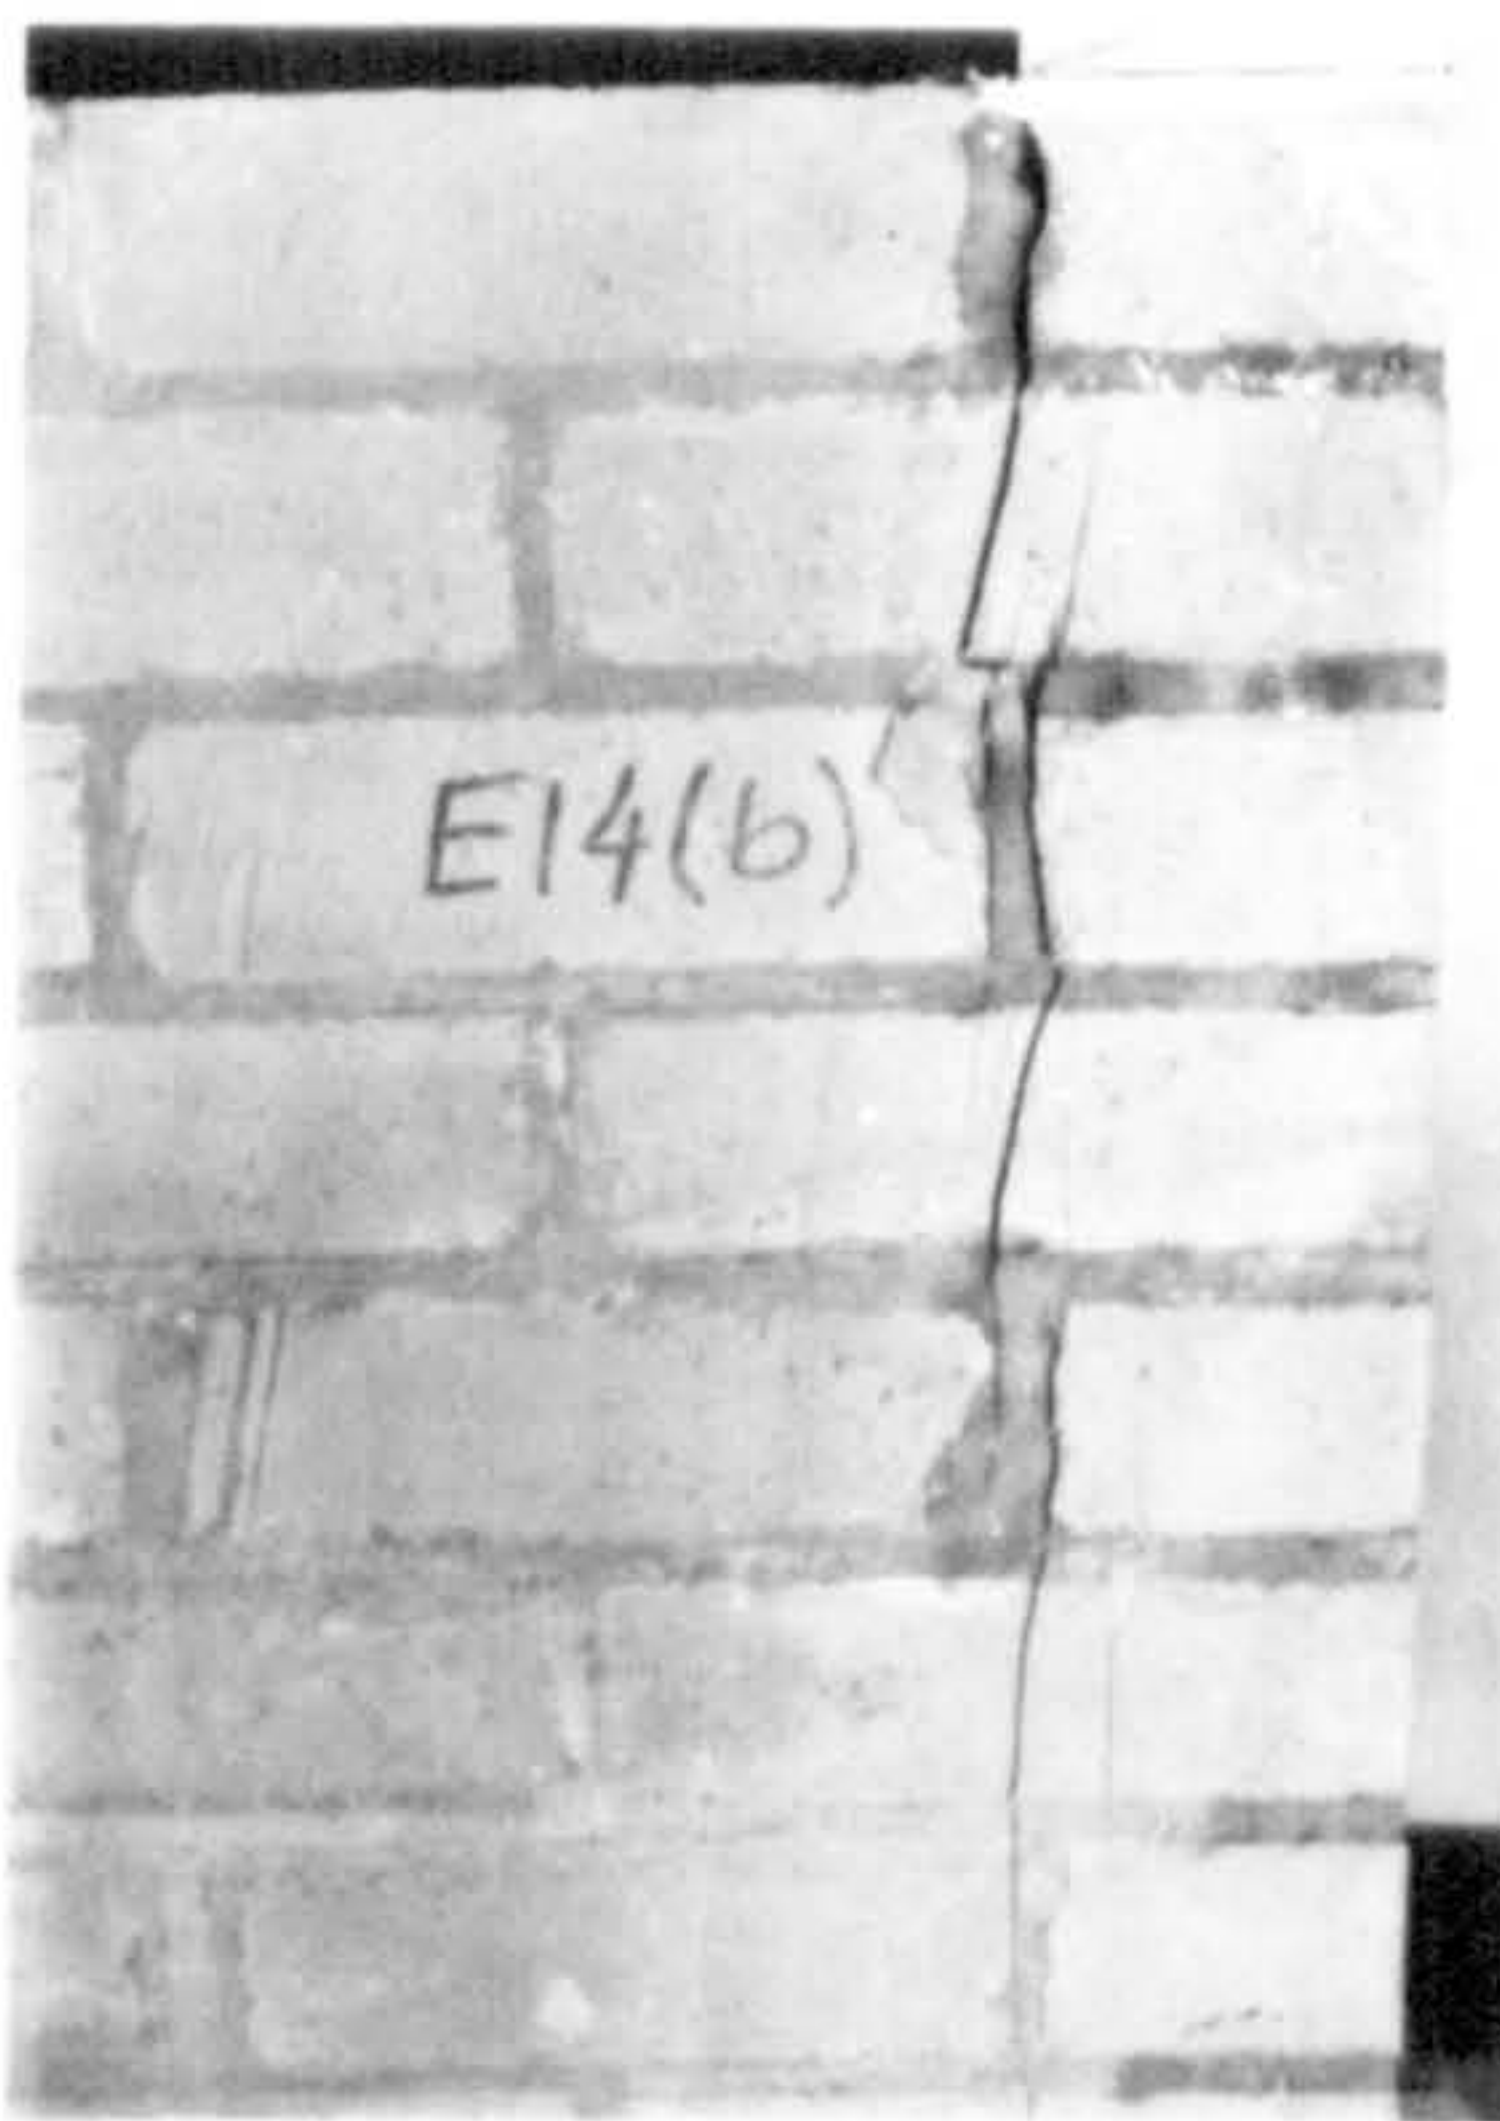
Typical failure mode and crack pattern for brickwork type G under intermediate strip loading ( $t=215.0\text{mm}$ ).
